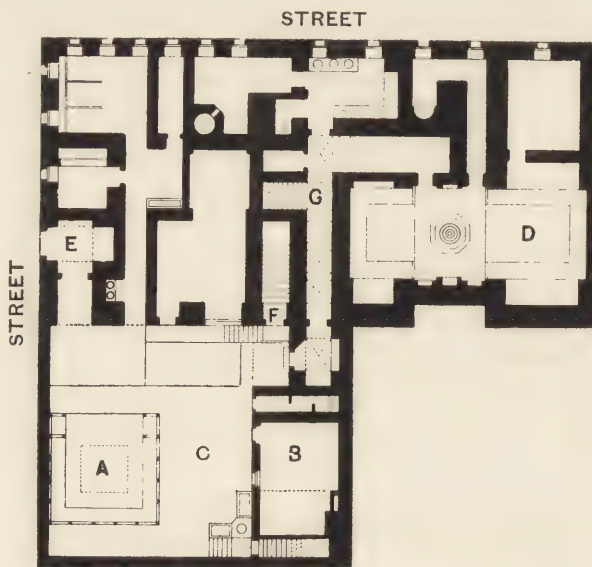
A HOUSE IN CAIRO: GROUND PLAN.
